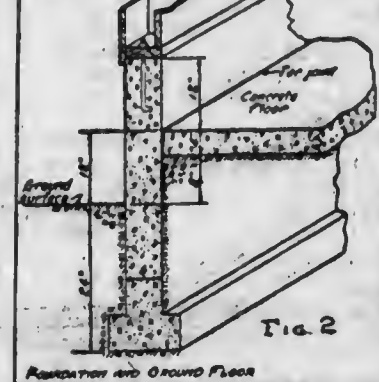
Showing a Good Method of Making Foundation and Floor of a New Building Ratproof.
